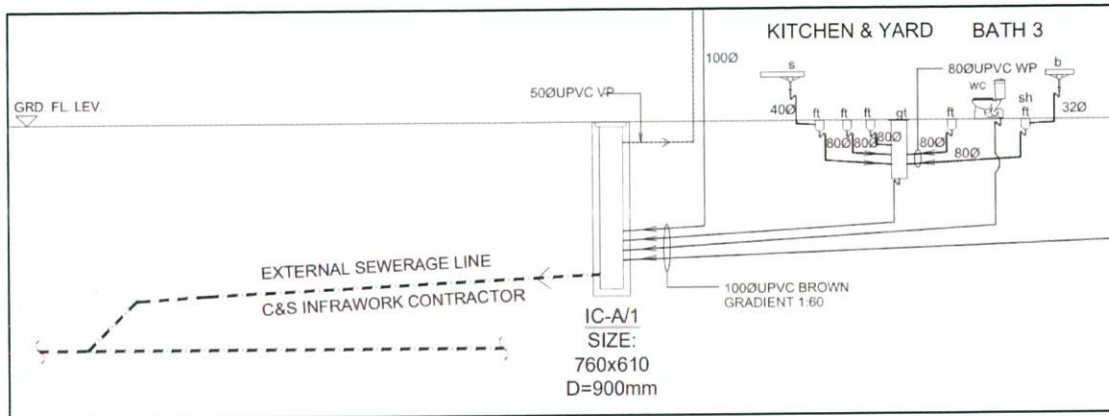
Typical Schematic Diagram For Type A (Standard) - Corner
